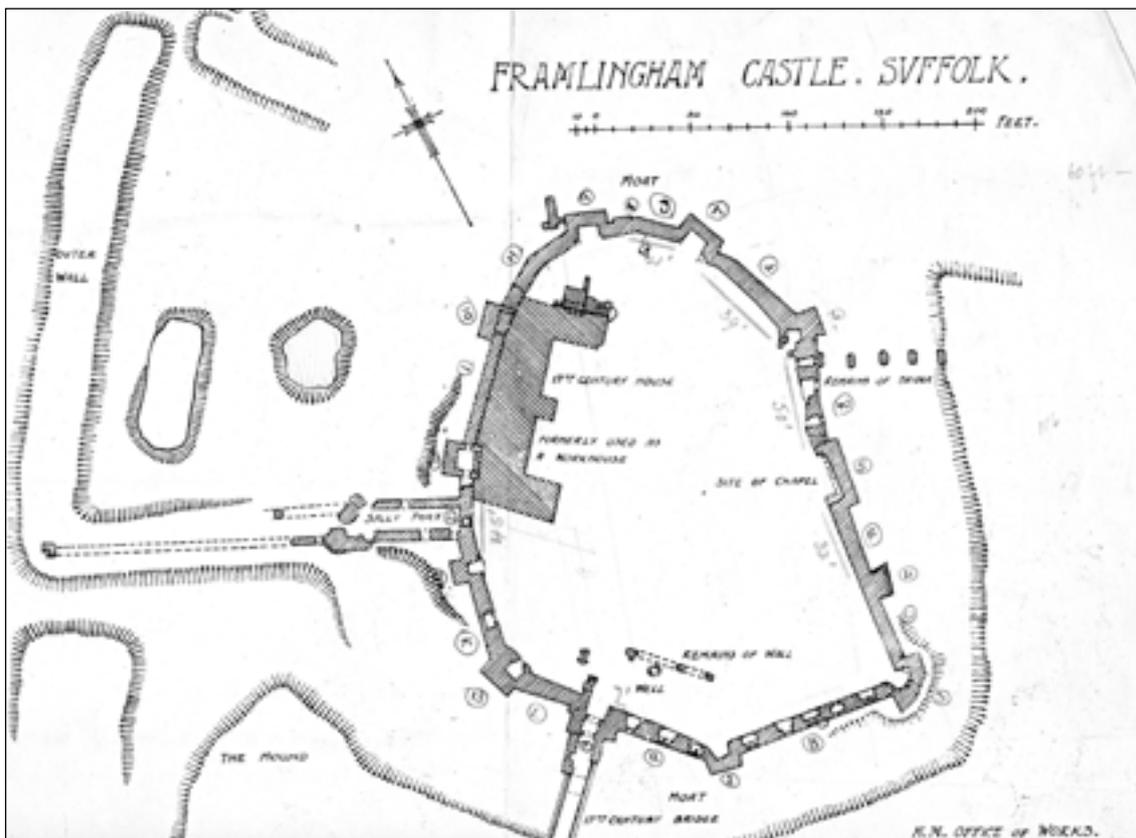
A site plan of Framlingham Castle dated 1919, showing the location of the workhouse, comprising buildings of the late 16th century, 1664 and 1729. (TNA WORK 14/685)
